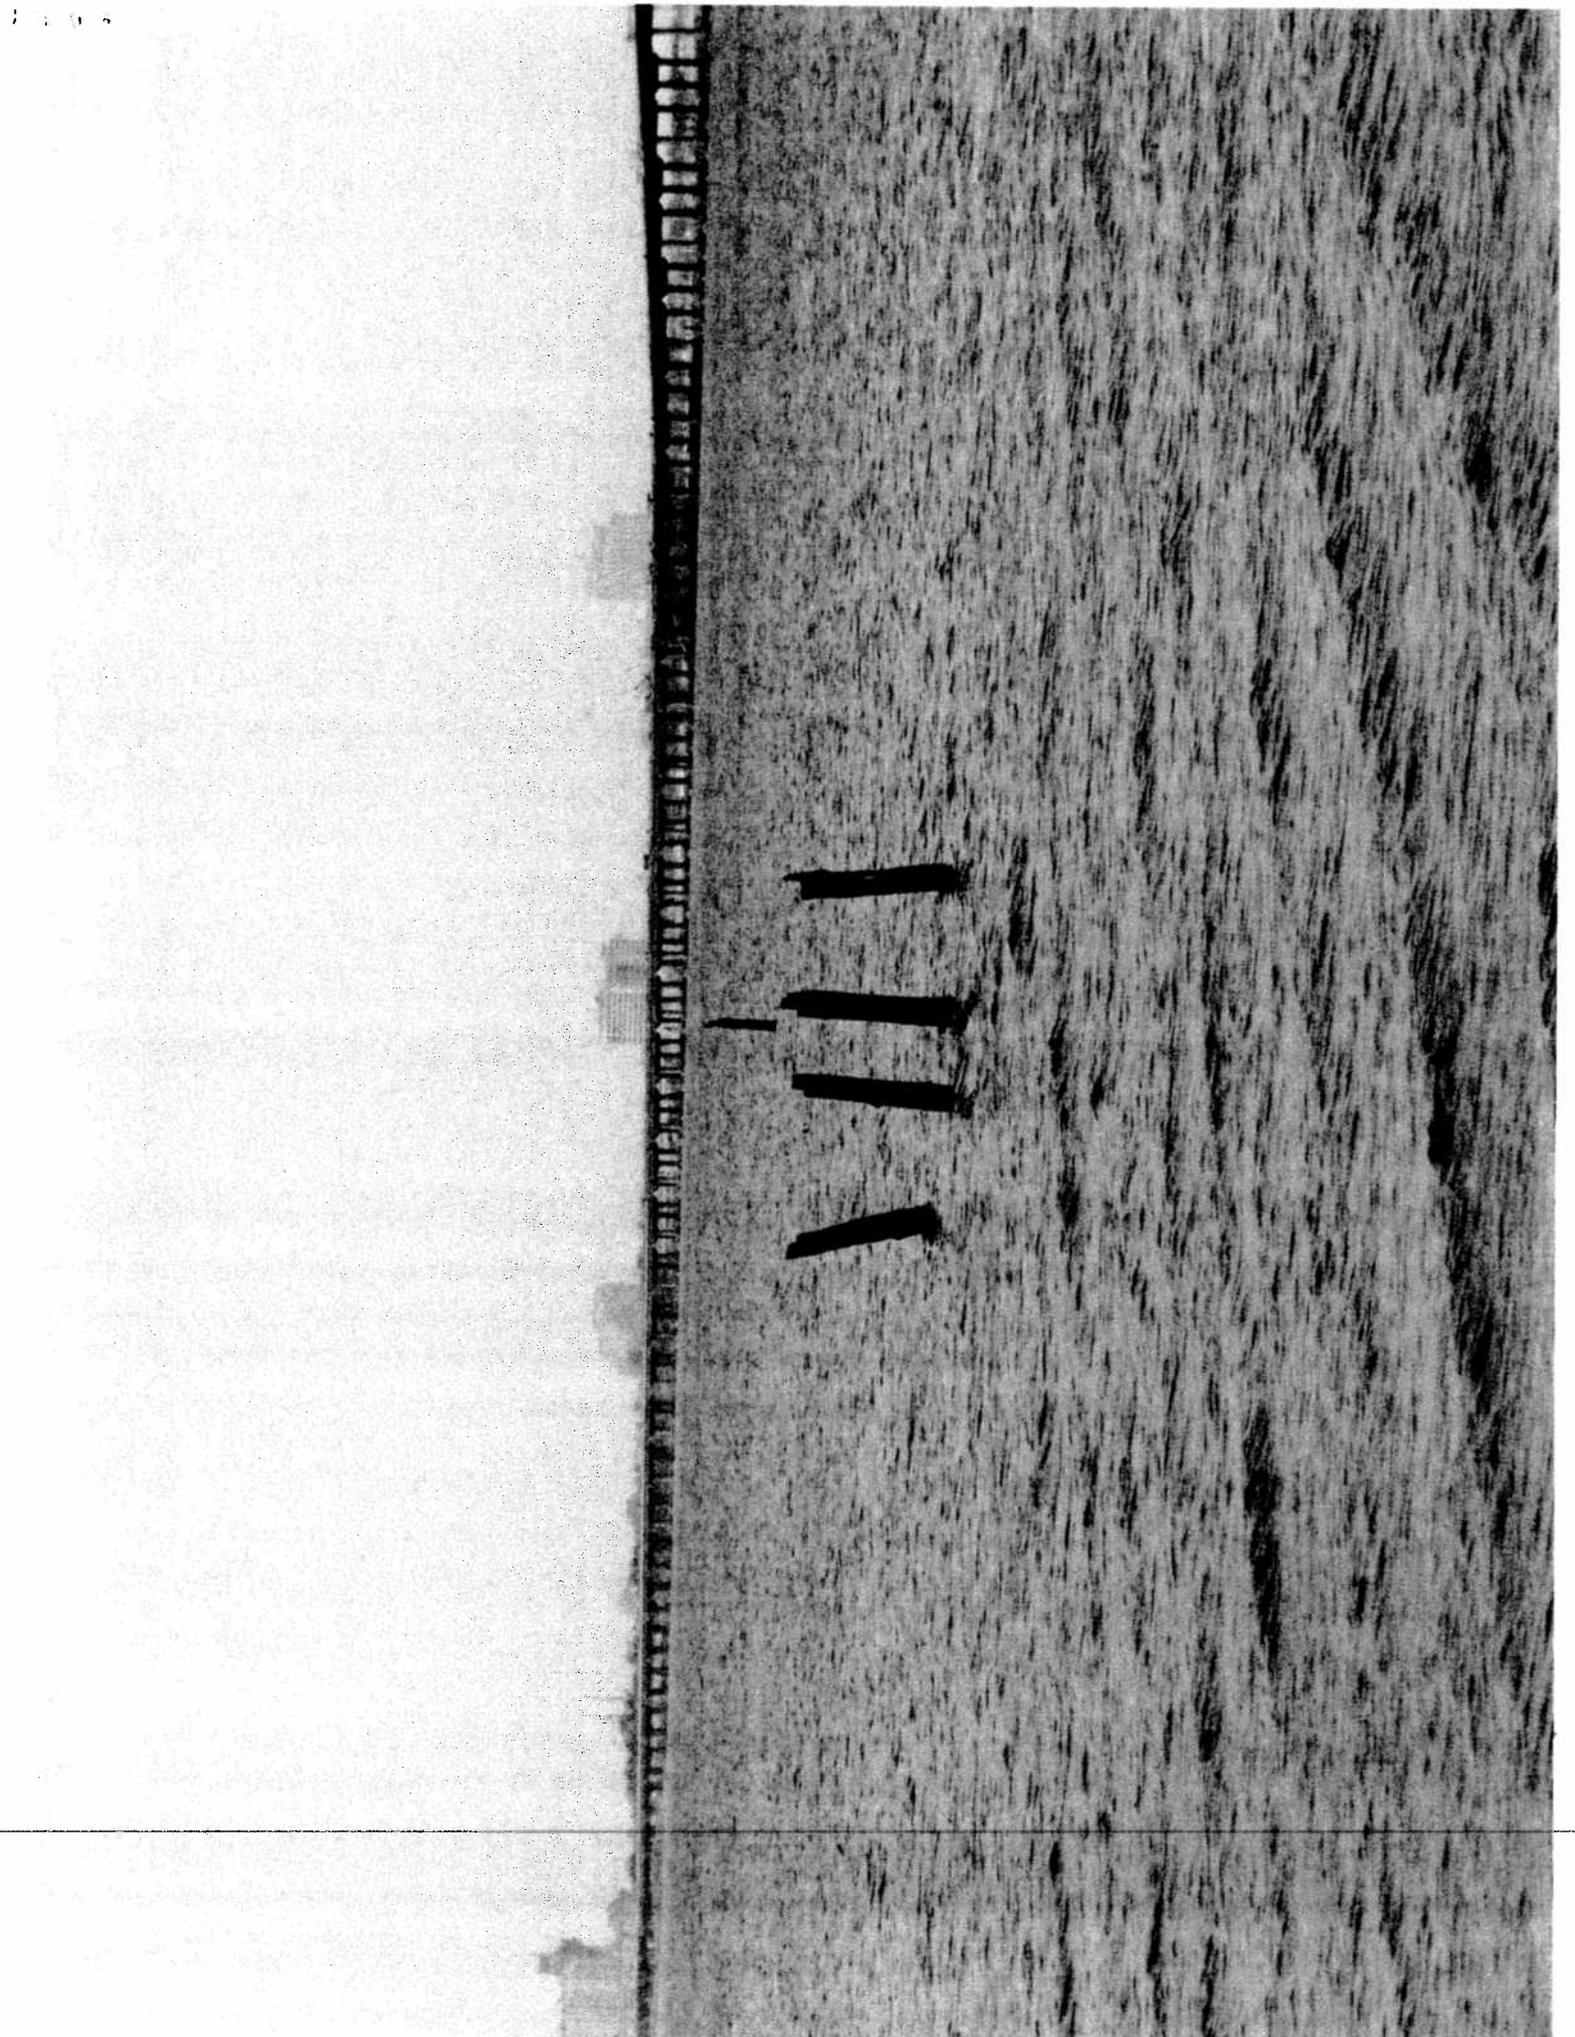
Remnants of previous pier. Northeast facing southwest.
